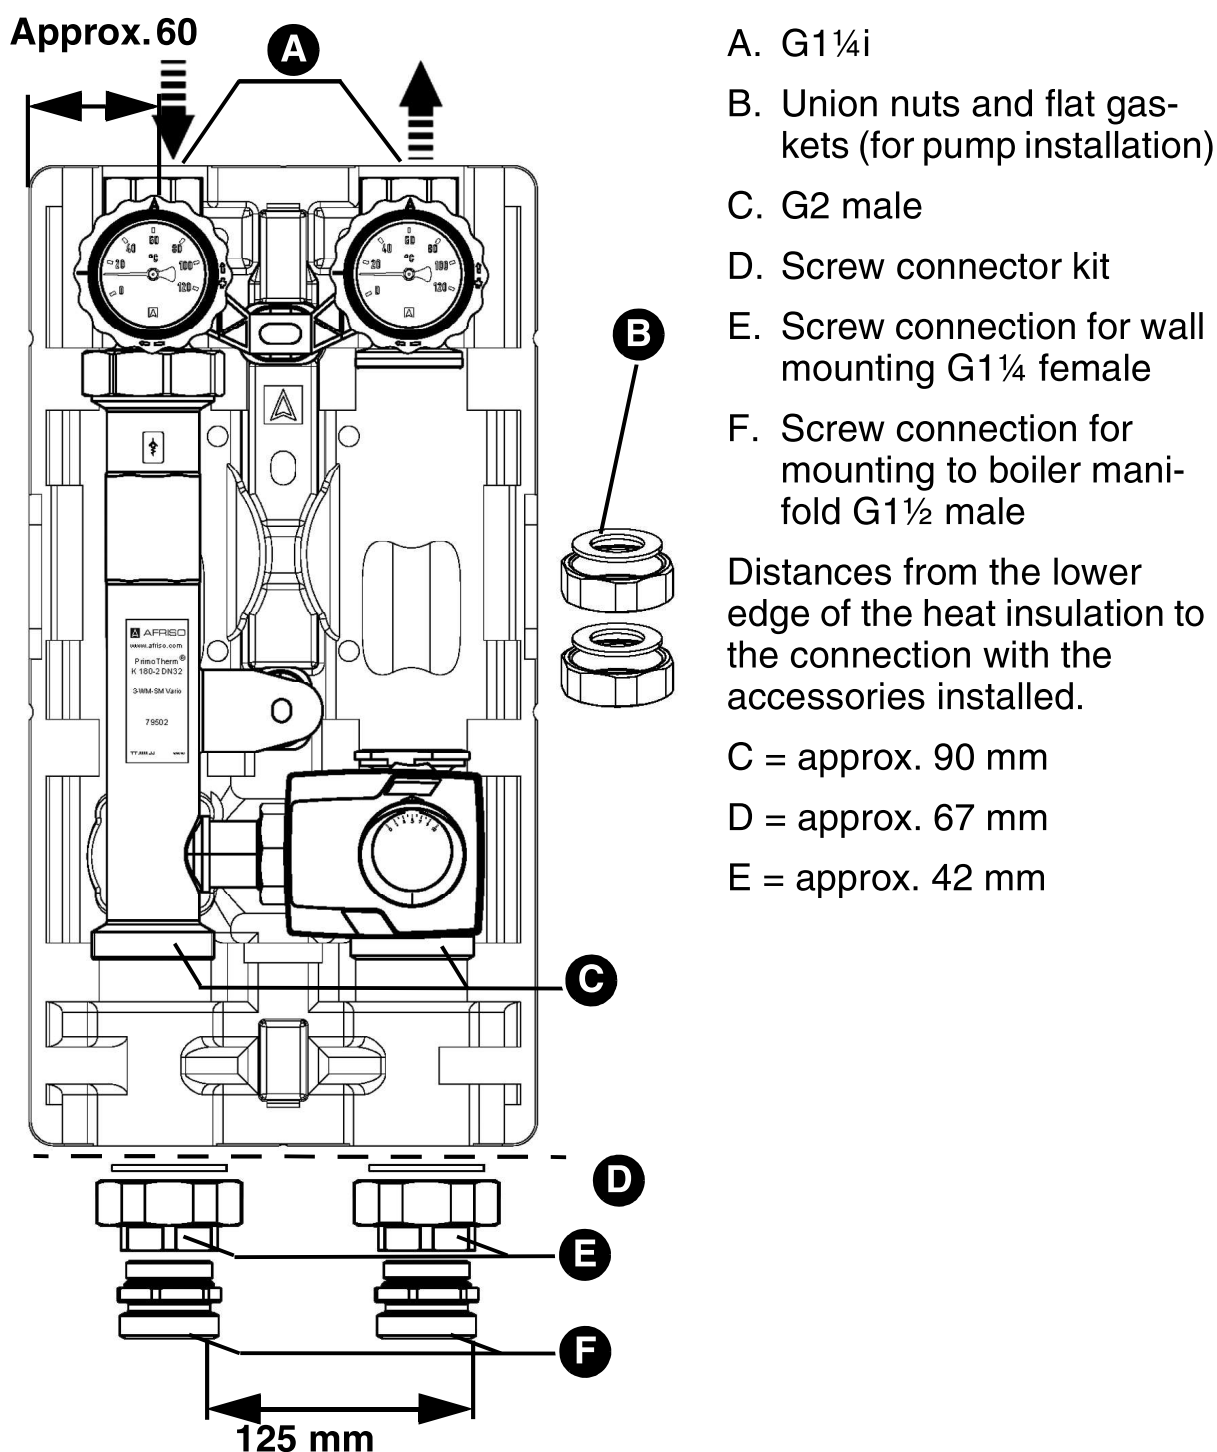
PrimoTherm® K 180-2 with screw connector kit
